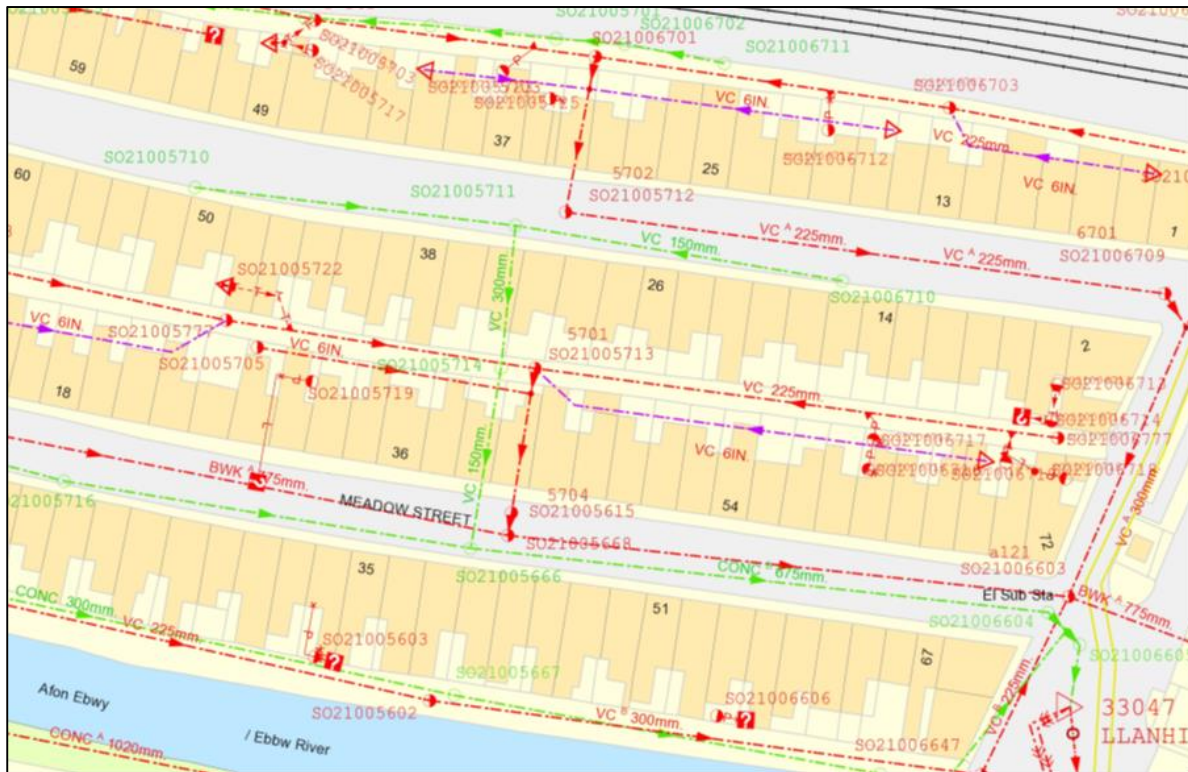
Plan showing the drainage infrastructure of Meadow Street and Railway Street (DCWW, 2020)
